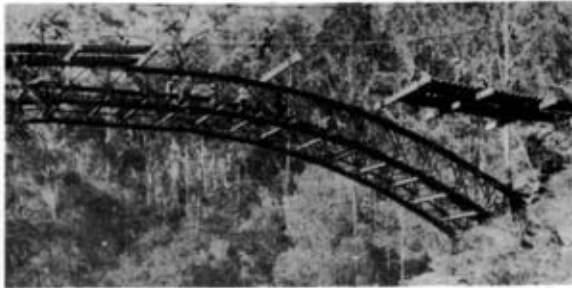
After completion of the arch the old bridge was demolished; working from the centre towards the abutments
